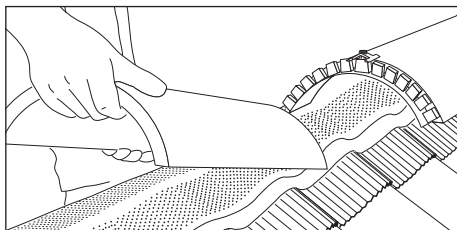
Ridge tiles laid with Universal RidgeFast unions
